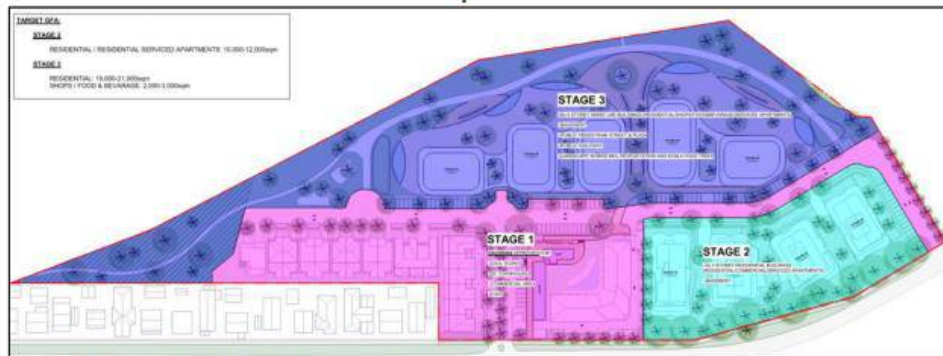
Proposed Staging Plan (Source: Rise Projects, 2023)
